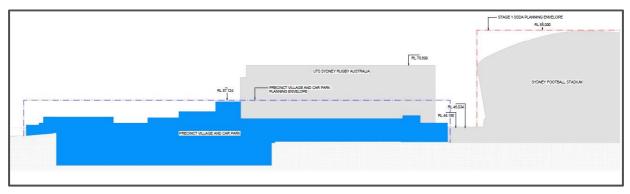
| Comparison of the stadium and existing administration buildings shown in grey and proposed Precinct Village and carpark building envelope shown in blue (Source: Modification 6 Architectural Plans)
